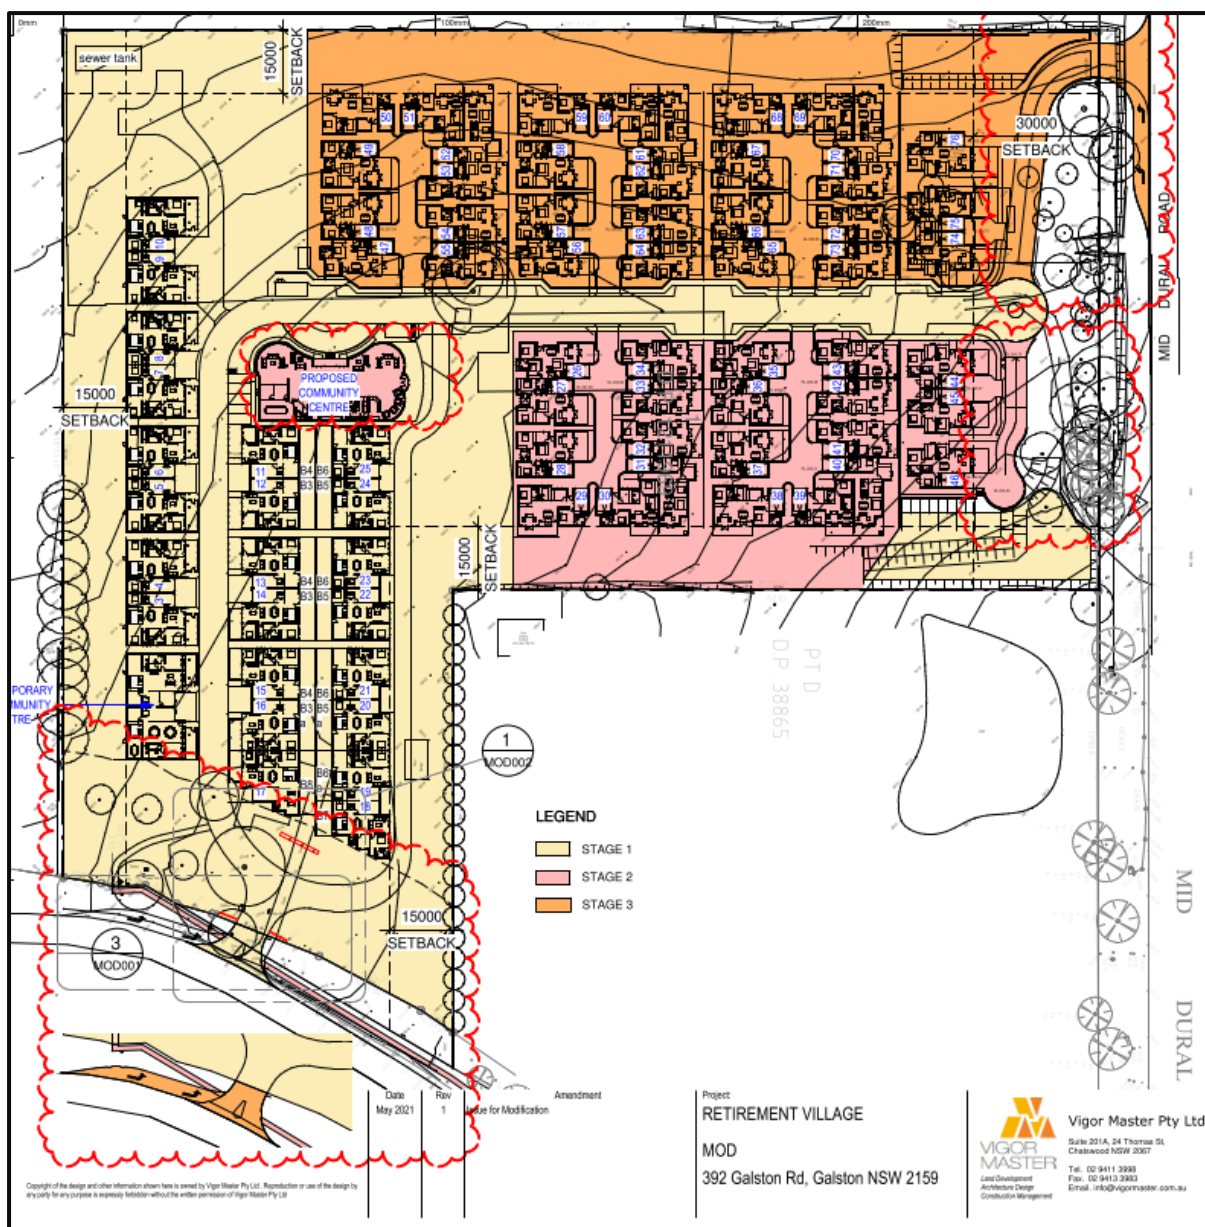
Extract showing proposed staging and modifications bubbled in Red.
